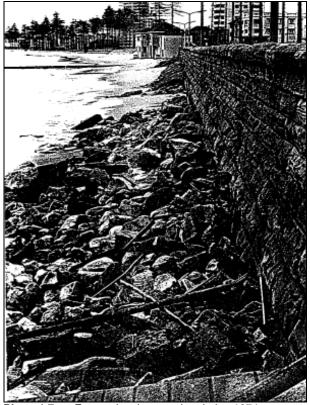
Exposed rock protection during 1974 storms – photo taken 10 June 1974 looking south towards North Steyne SLSC
